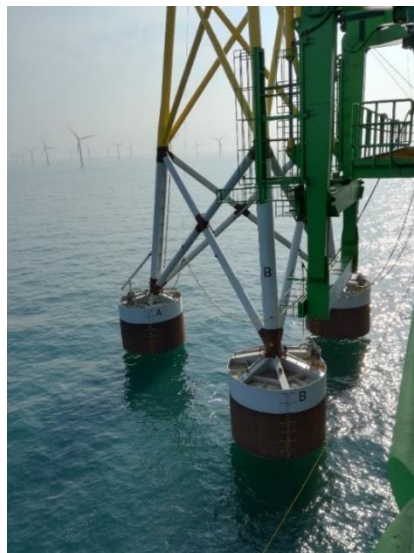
Pump technology for suction bucket jacket ([www.framo.com](http://www.framo.com))
